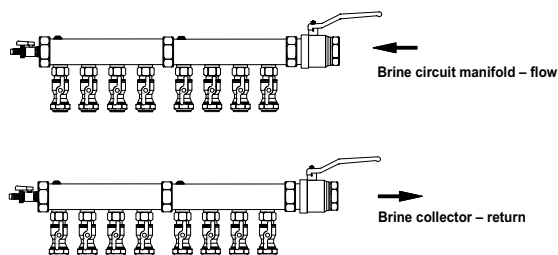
Mounting a brine circuit manifold with a maximum of 8 circuits
